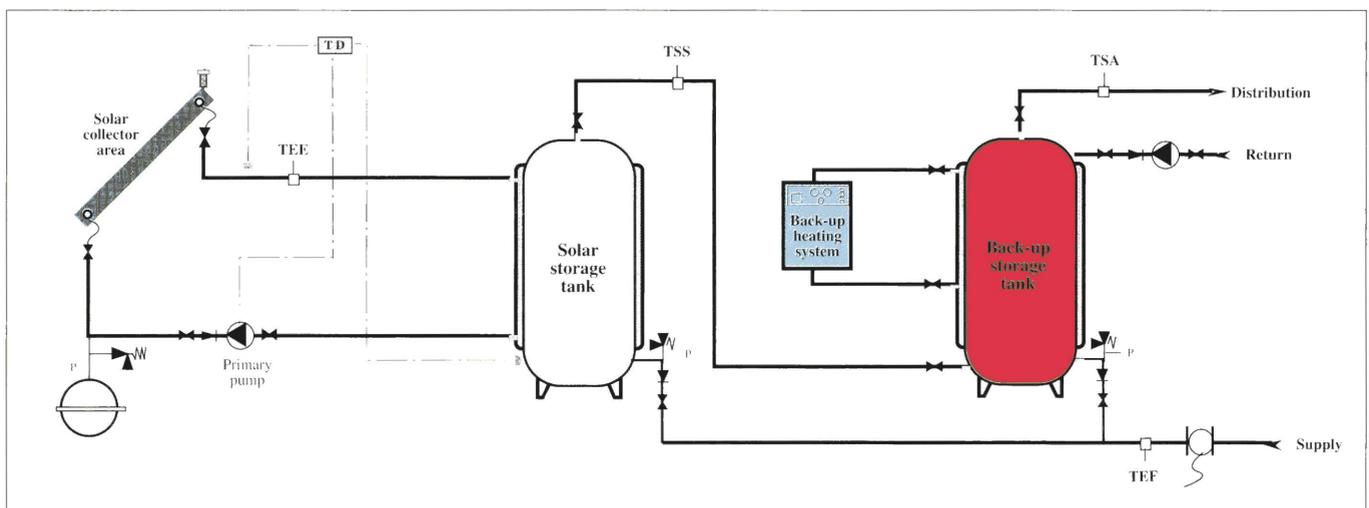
Schematic layout diagram of the solar installation for the “Pabellón cubierto” in Villena.
